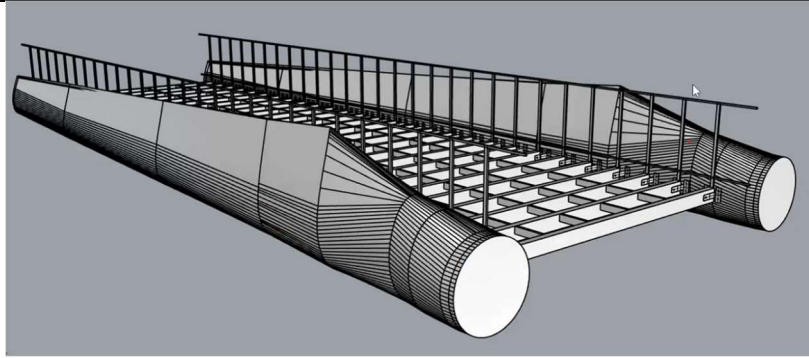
Preliminary render of blade bridge design showing Nordex N29 blade sections as primary load bearing members
